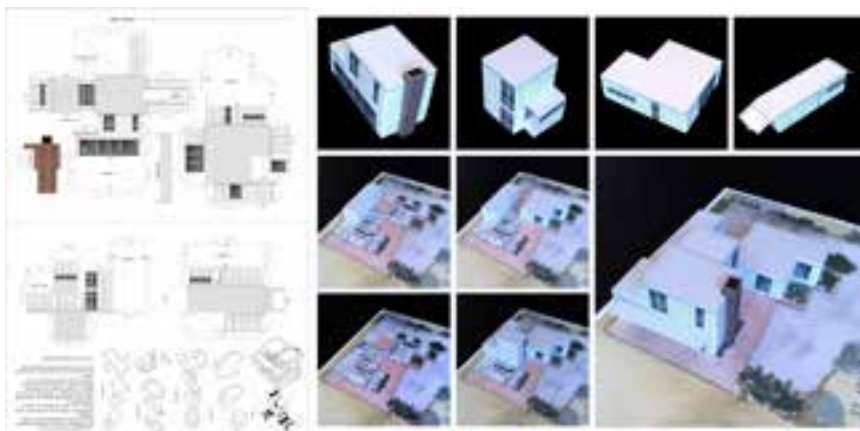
Photographic series: Cutout sheets and pictures of the assembly process (© Fernando Jiménez Parras).
